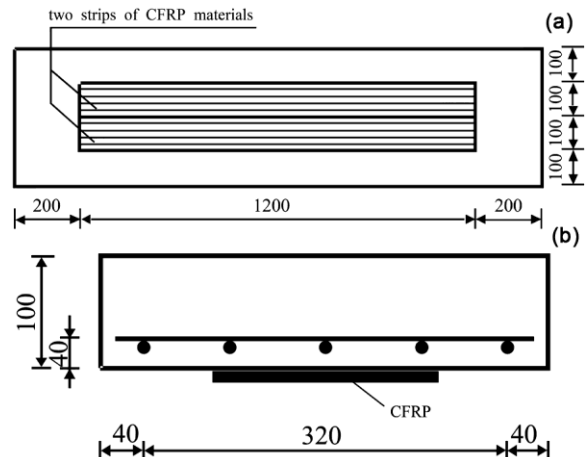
CFRP strengthening design (a) Plane view and (b) Section view (in mm).
